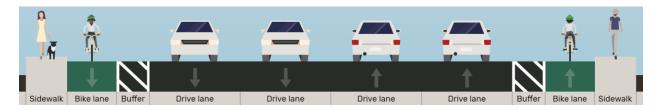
Typical Cross-Section—Alternative 1 (No Side Street Restriction)
